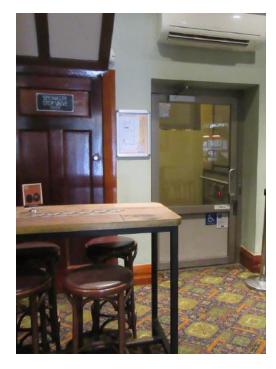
The wheelchair lift was added in 2010–2011 to provide access from G.25 to G.27, on the upper section of the first floor. Source: TKD Architects 2020.
